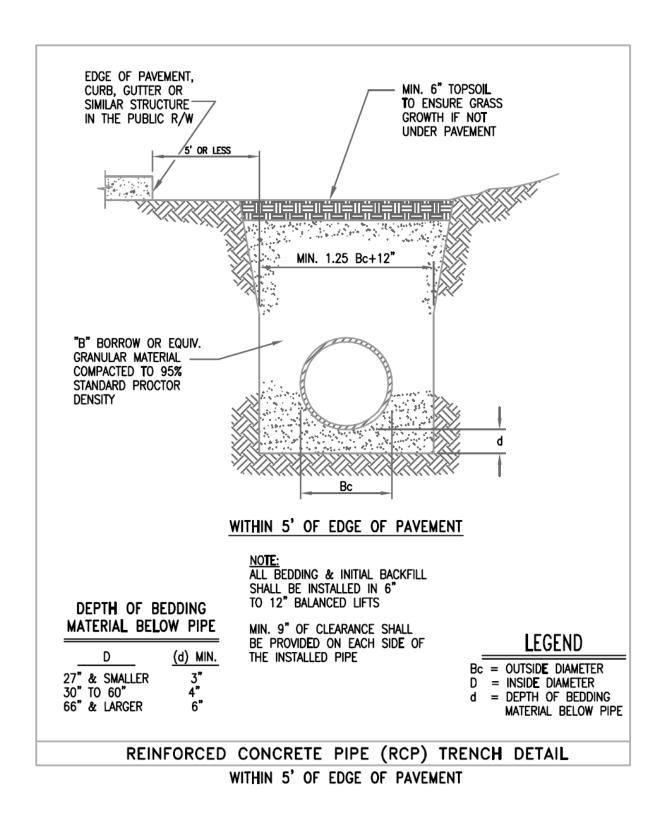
Reinforced Concrete Pipe (RCP) Trench Detail – within five feet of edge of pavement
